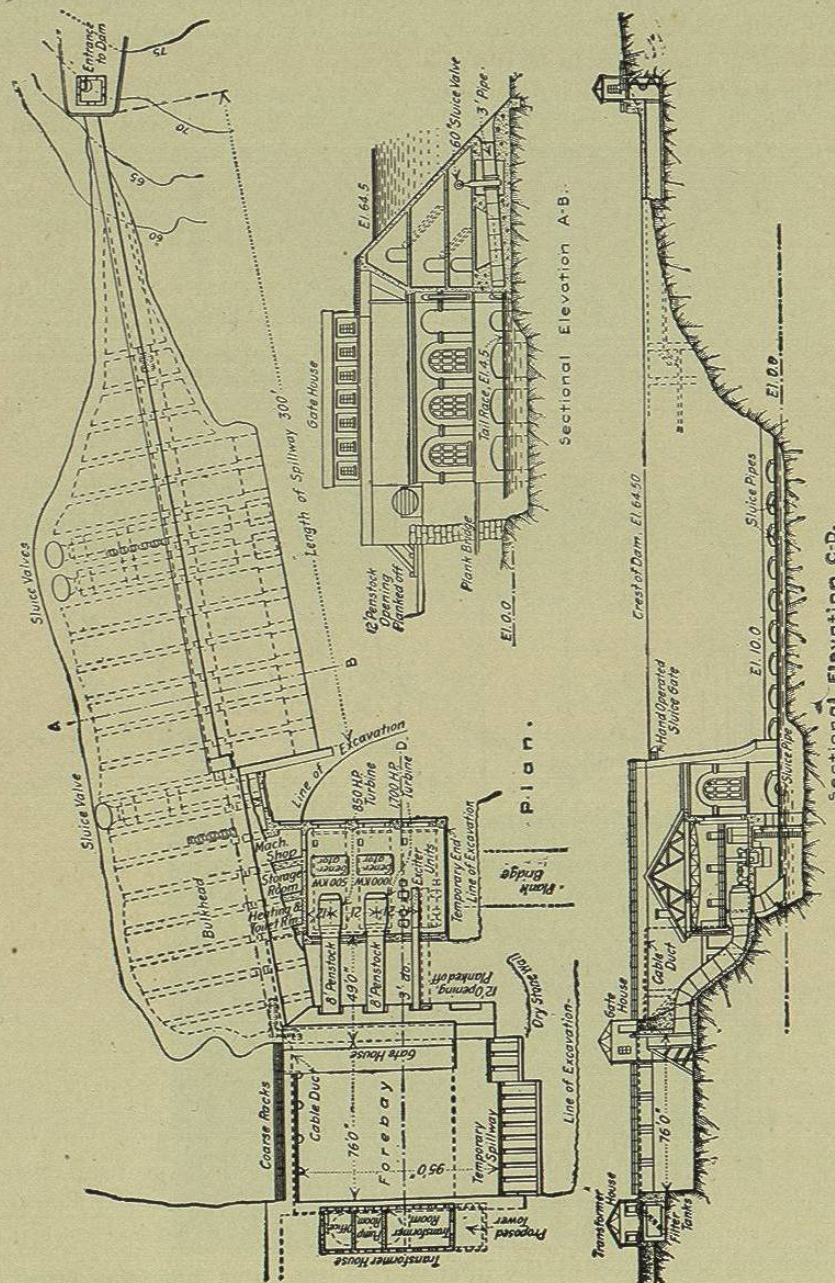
PLAN AND ELEVATION OF ELLSWORTH DAM.
